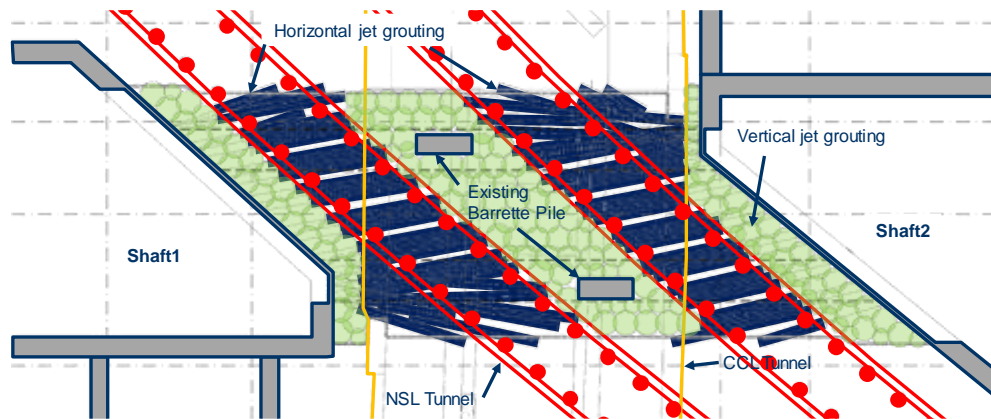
Arrangement of vertical and horizontal jet grouting piles (plan view).
